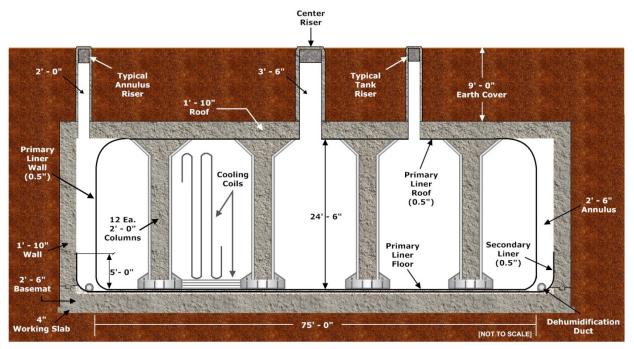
Typical HTF Type I Waste Tank Cross-Section
